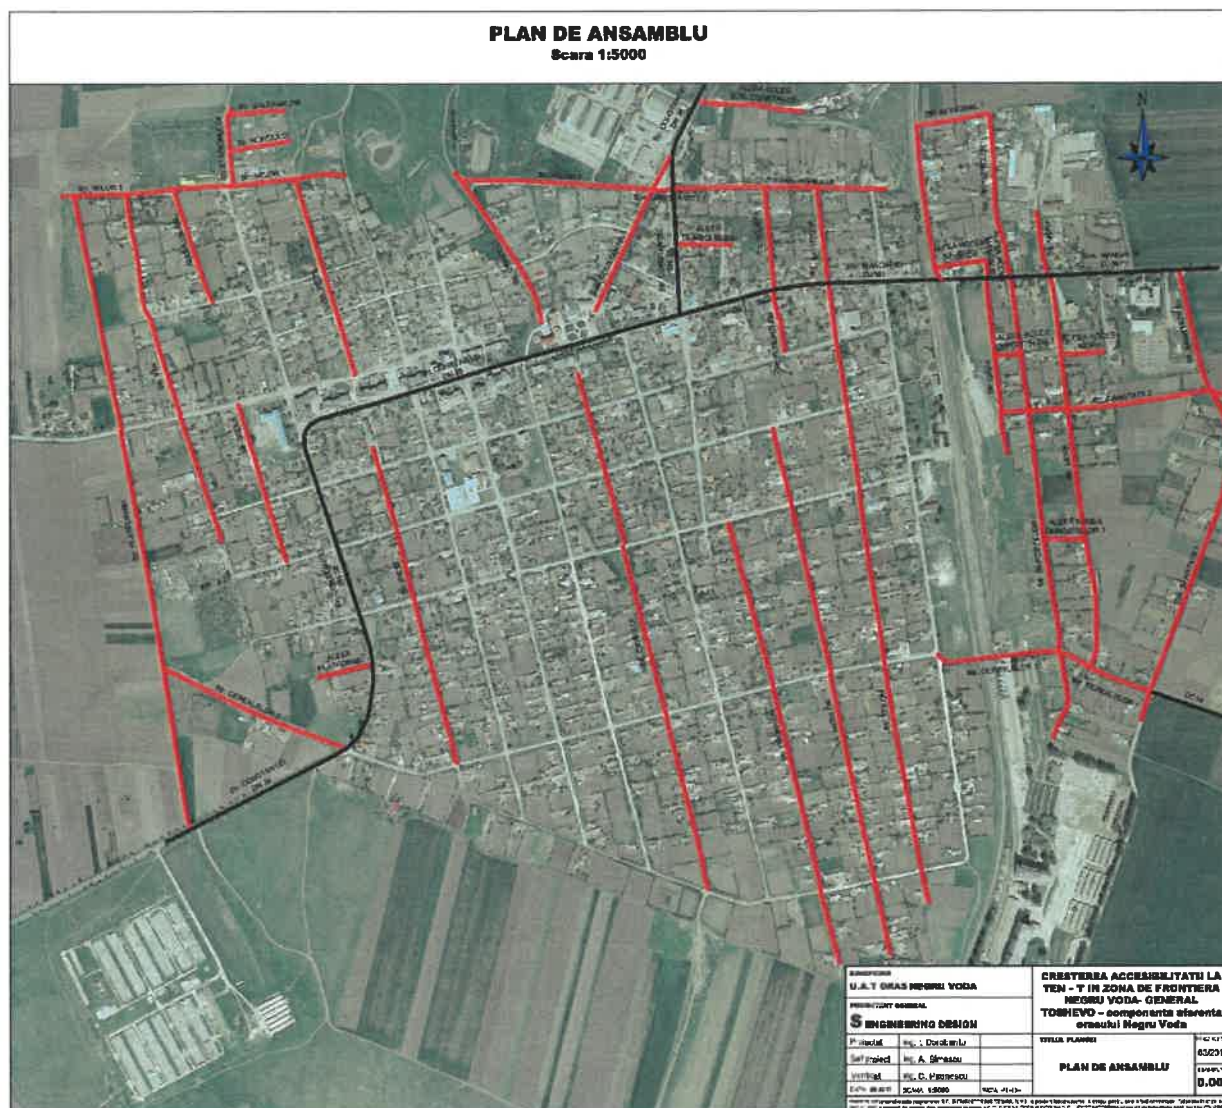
Modernized roads. Data source: NegruVodă Town'sTown Hall.
